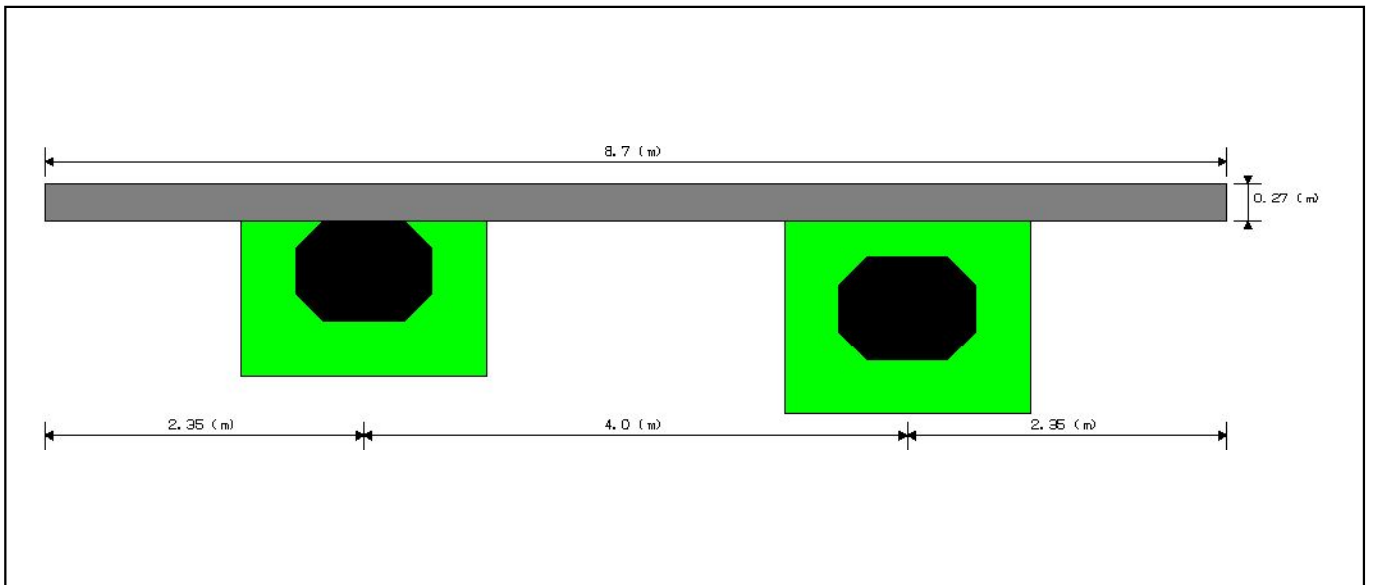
Down station view for girder layout in Span09 - Station 0.0 .
